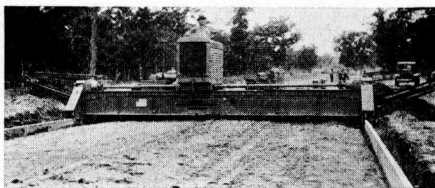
Removal of Excess Soil down to Subgrade without Disturbing the Soil below the Subgrade Elevation.
